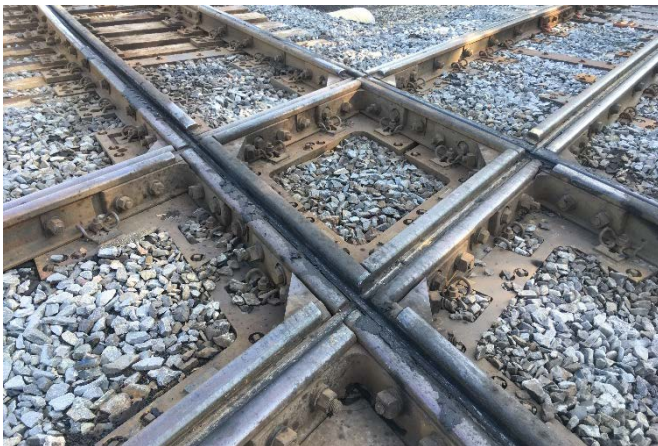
Fully Flange Bearing Crossing Diamond in Revenue Service
